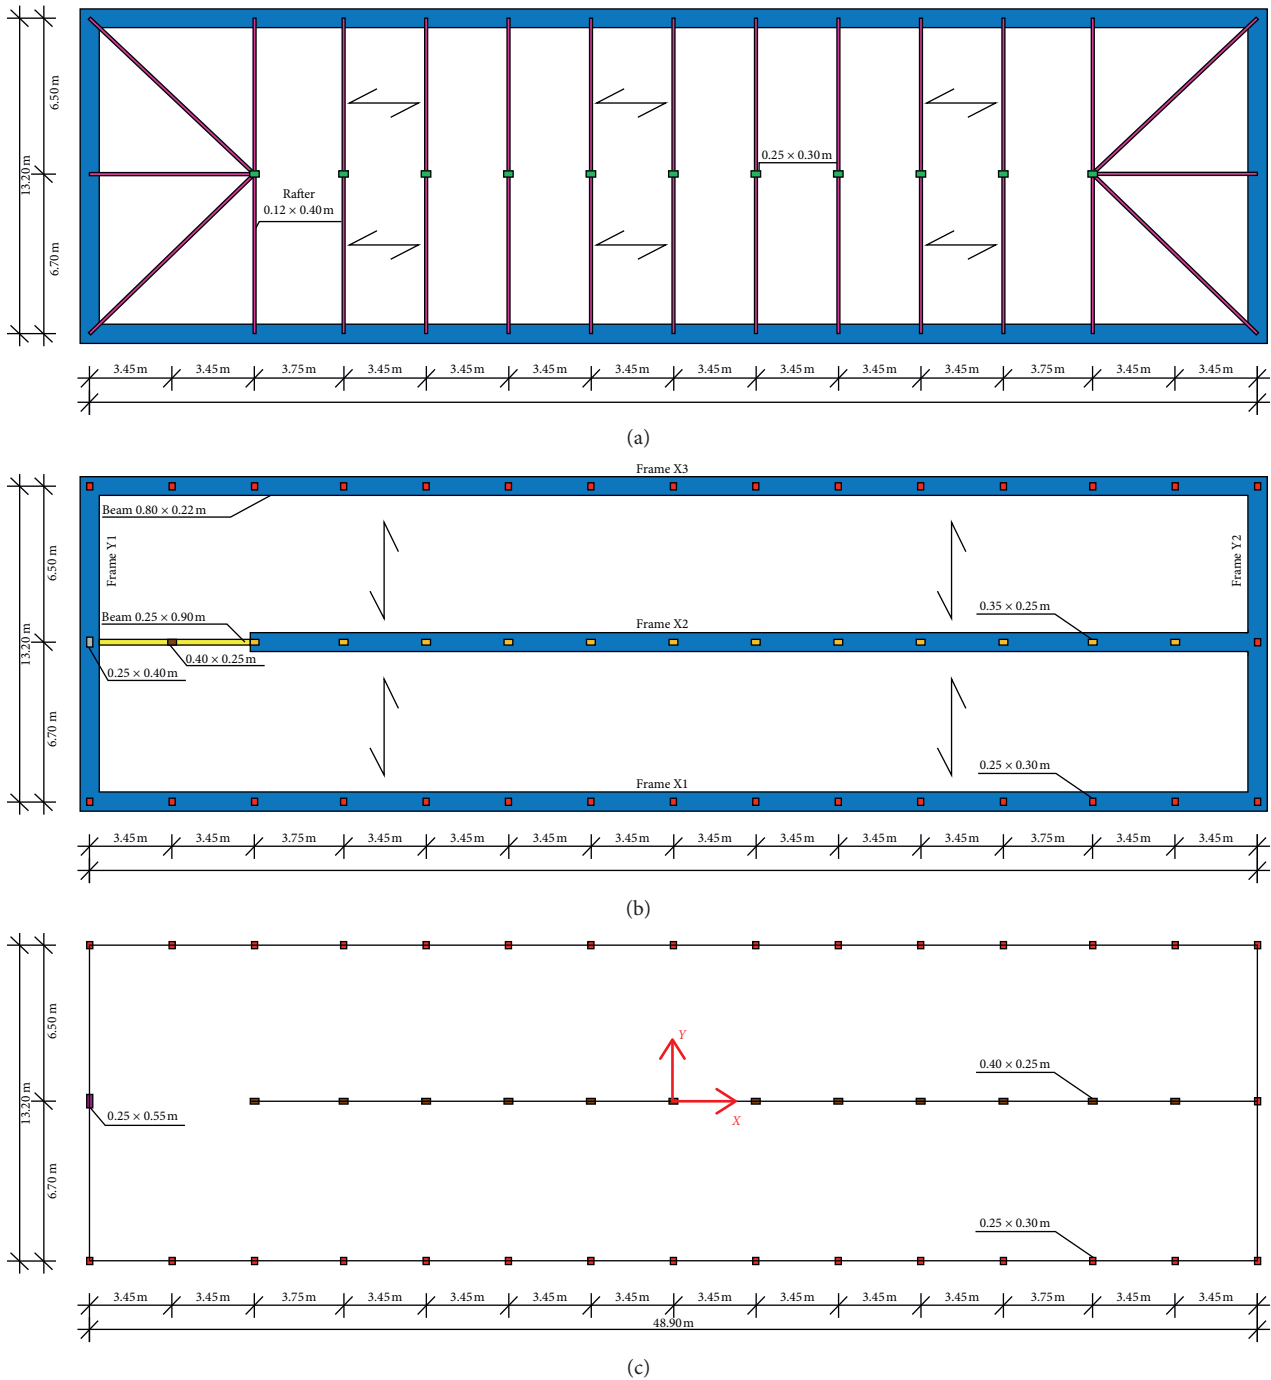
Reference plan of the building that shows the three longitudinal frames (x direction) and the two transversal frames (y direction): (a) roof plan; (b) upper floors plan; (c) ground floor plan.
